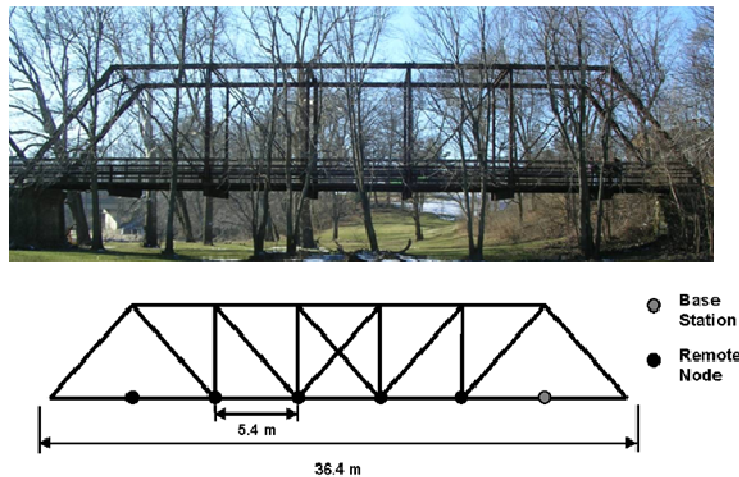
Steel truss bridge in Mahomet, Illinois (top) and testing layout and dimensions (bottom).
